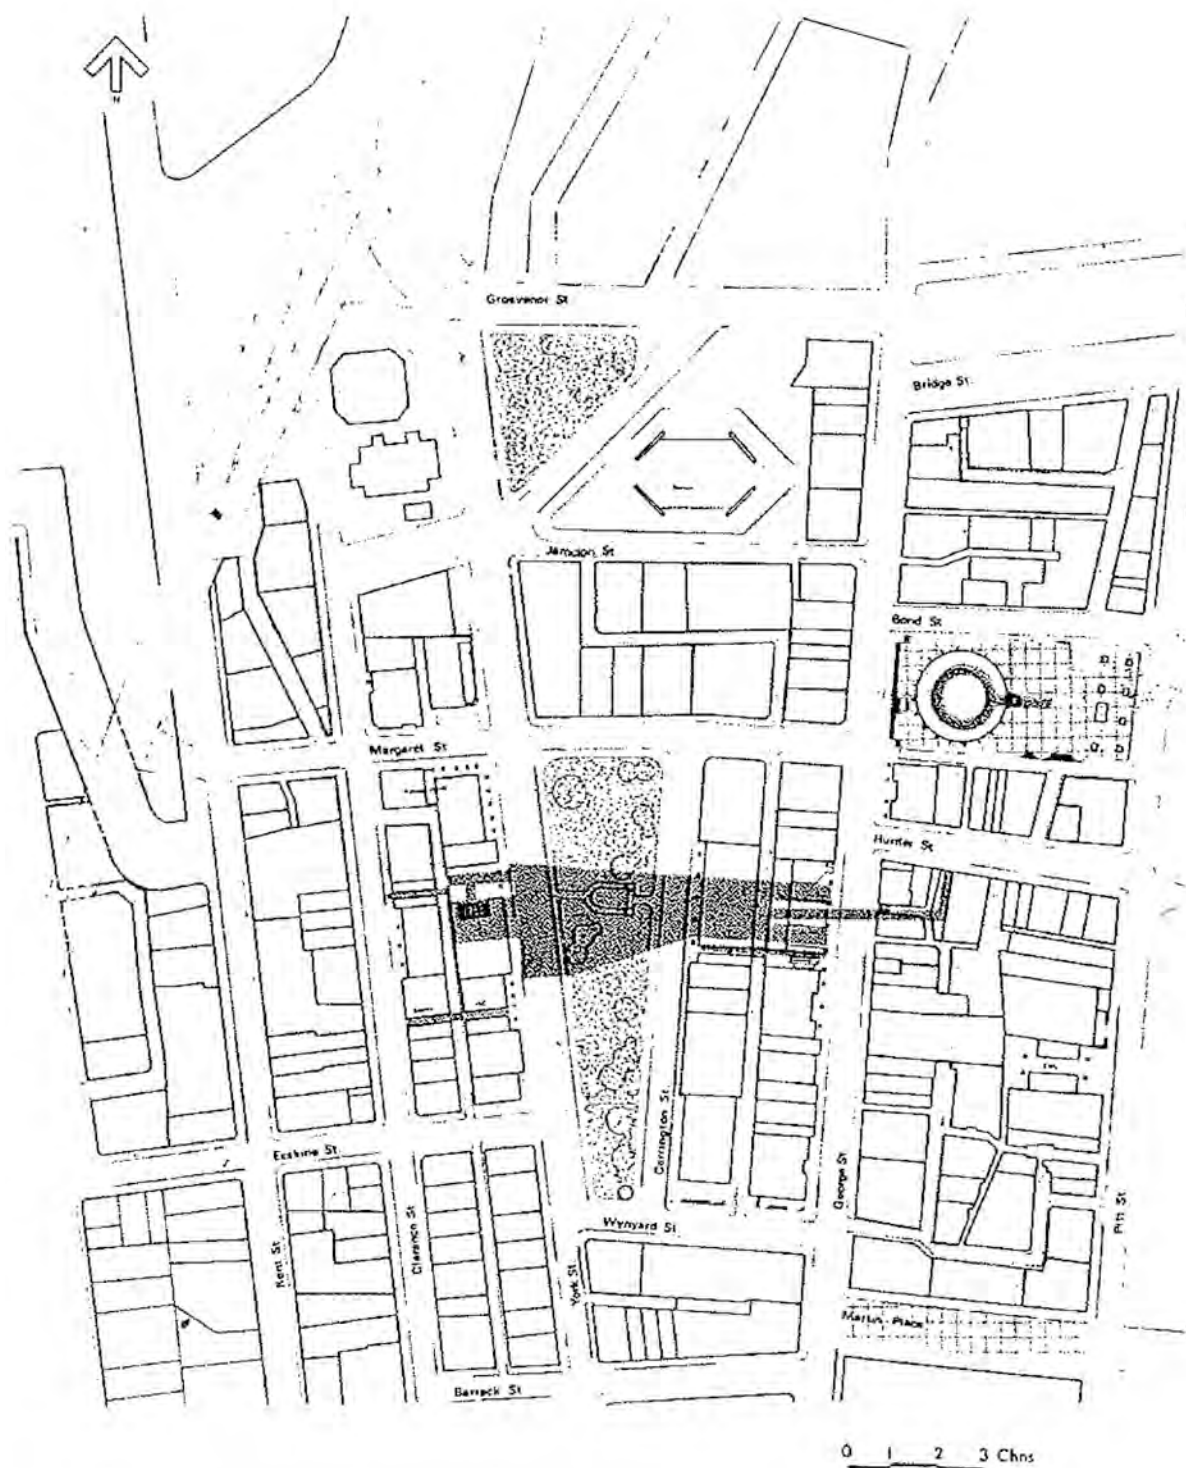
1963 plan of the general arrangement for Wynyard Station showing pedestrian subways and exits. This plan shows no changes from the original plan drawn in 1929 in the arrangements for pedestrian access to and from Wynyard from Carrington Street through to George Street. (Source: State Records R121 10.C.123A)
